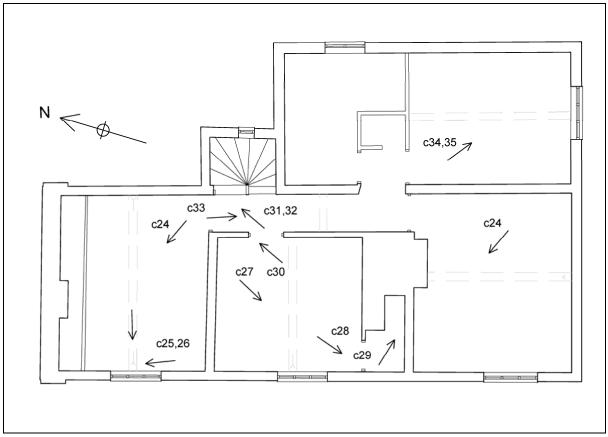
Location of photographs of Hill Farm, Fenny Drayton, first floor held in archive
